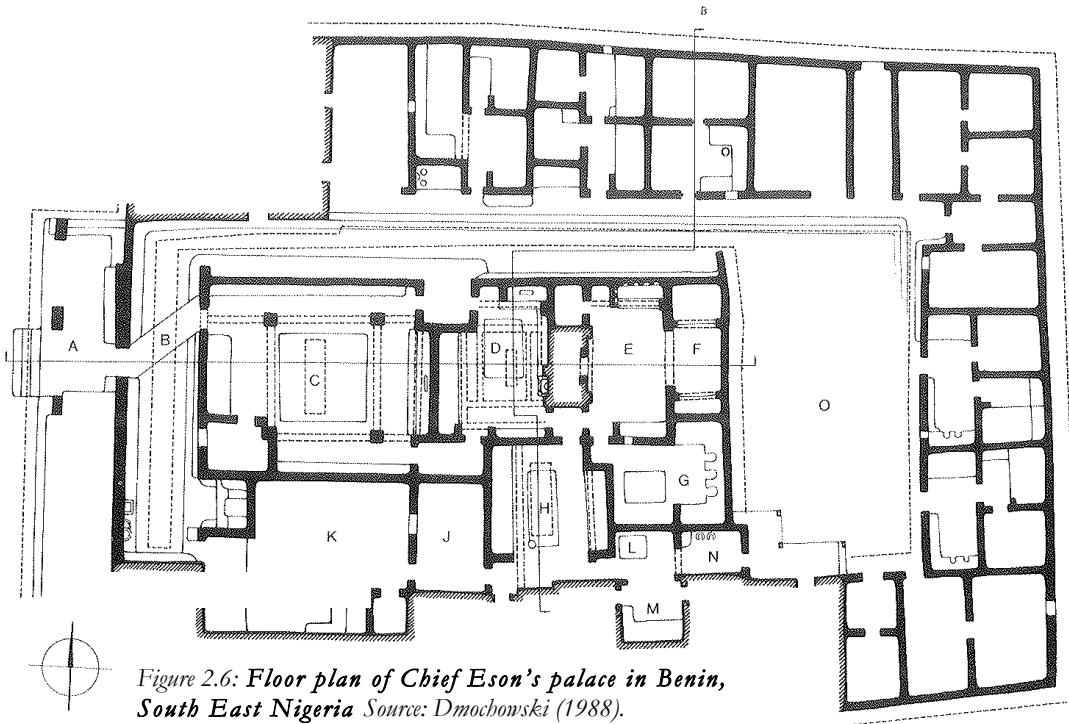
Floor plan of Chief Eson's palace in Benin, South East Nigeria
